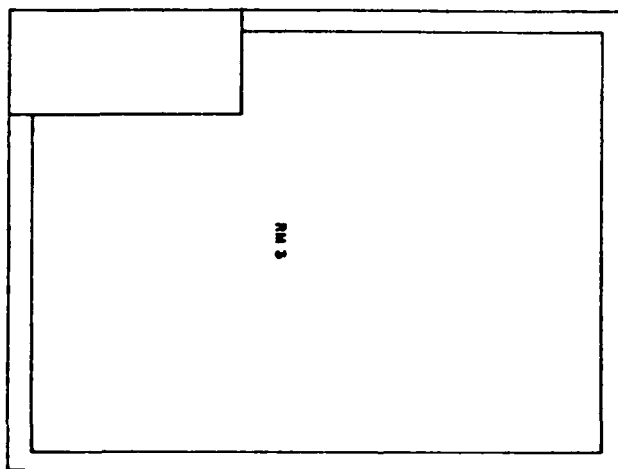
Floor plan Building 1, Room 3, Tract 301.
